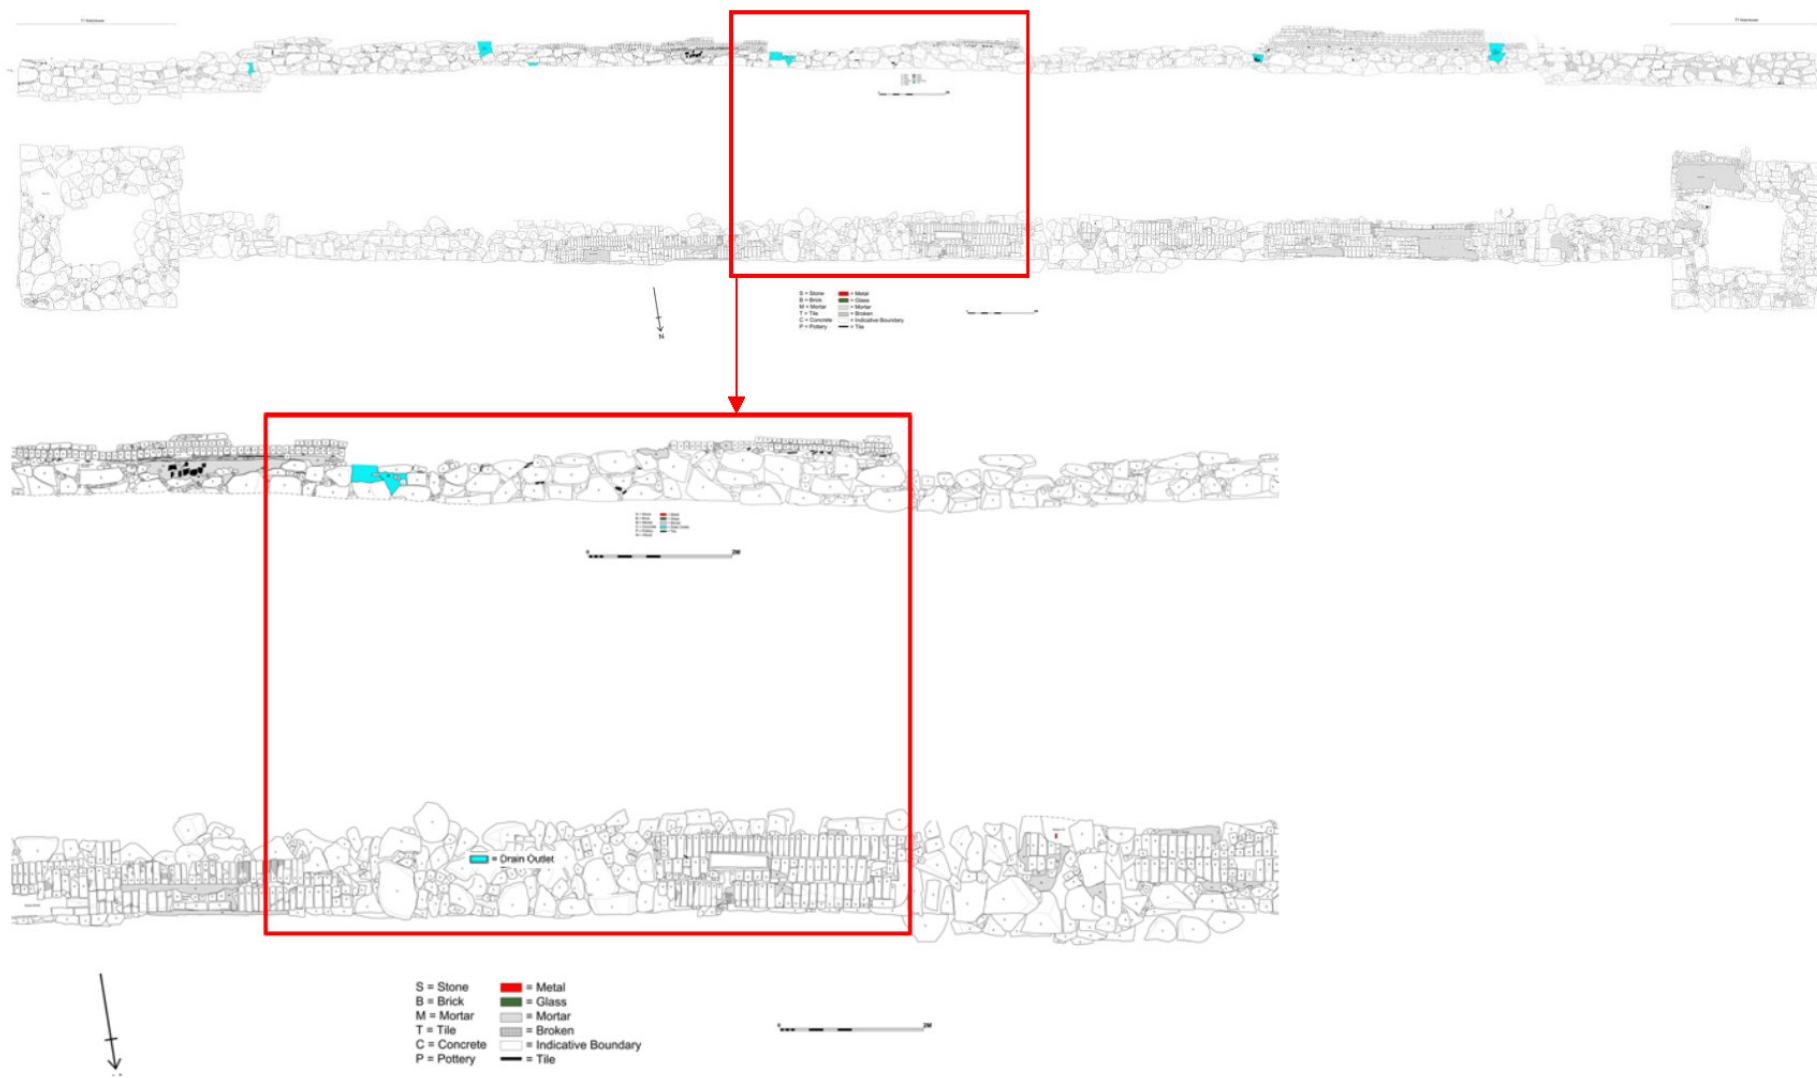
Position of the to-be-relocated area within the entire northern wall foundation remains and section and ground plan of the proposed relocation section.
